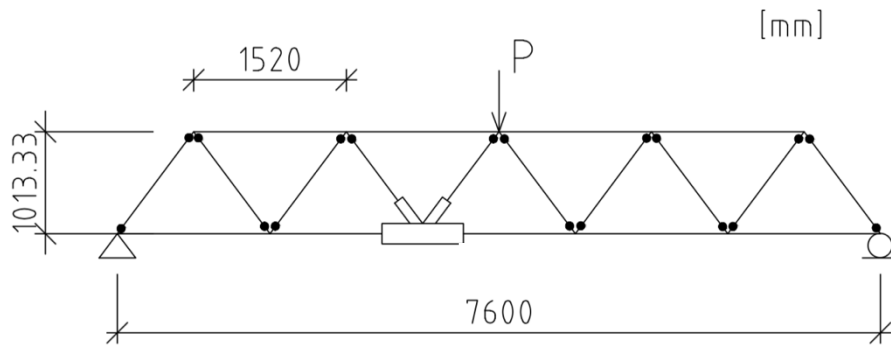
Model of truss structure, each dot indicates a pinned connection between chord and brace.
